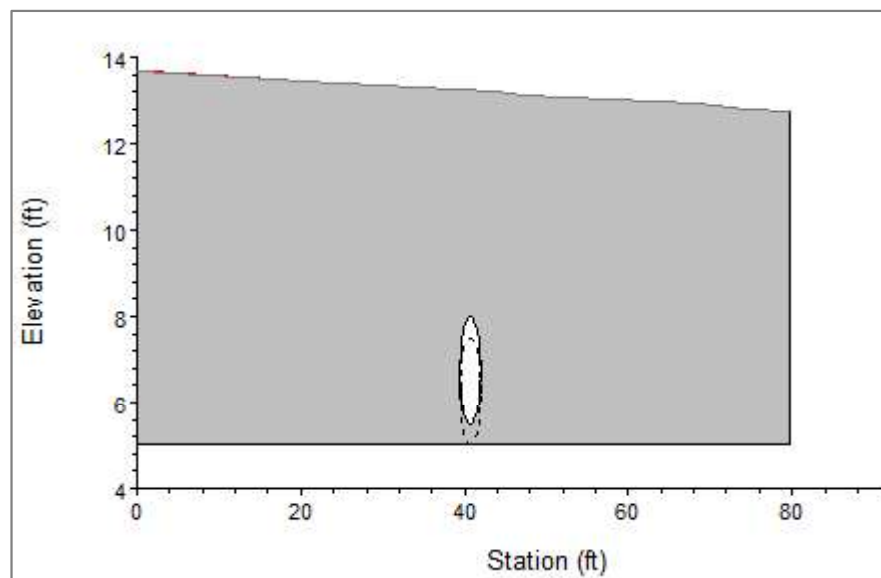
Proposed Culvert #3 Cross-Section on Kaihalulu East Roadway
